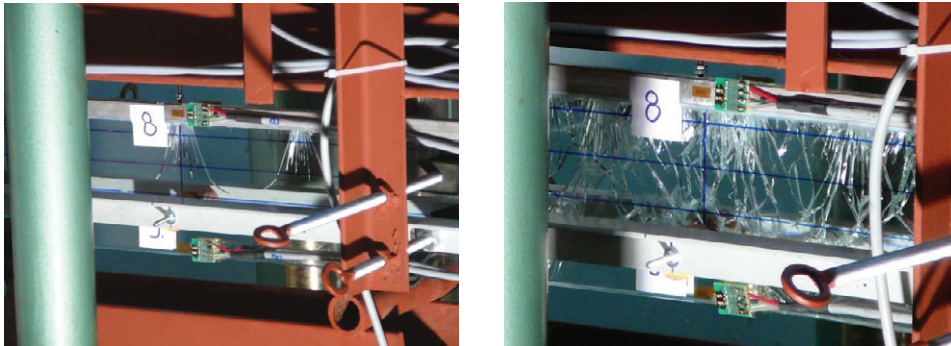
Initial cracks on the tension edge of the reinforced glass beam, the irregular cracks pattern immediately before the final collapse of the reinforced glass beam
